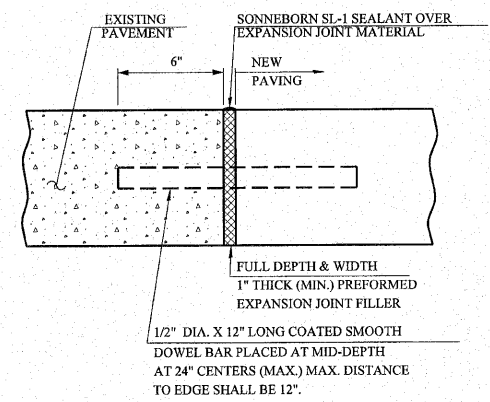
DETAIL OF COMMERCIAL/ ALLEY ENTRANCES WITH NEW PAVEMENT BEHIND NEW SIDEWALK
